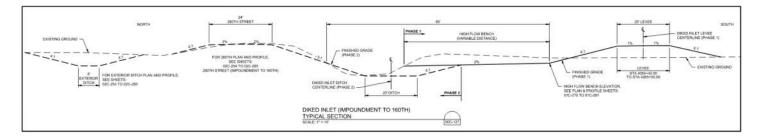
TYPICAL ROAD SECTIONS ALONG DIKED INLET (SOURCE: HDR)
